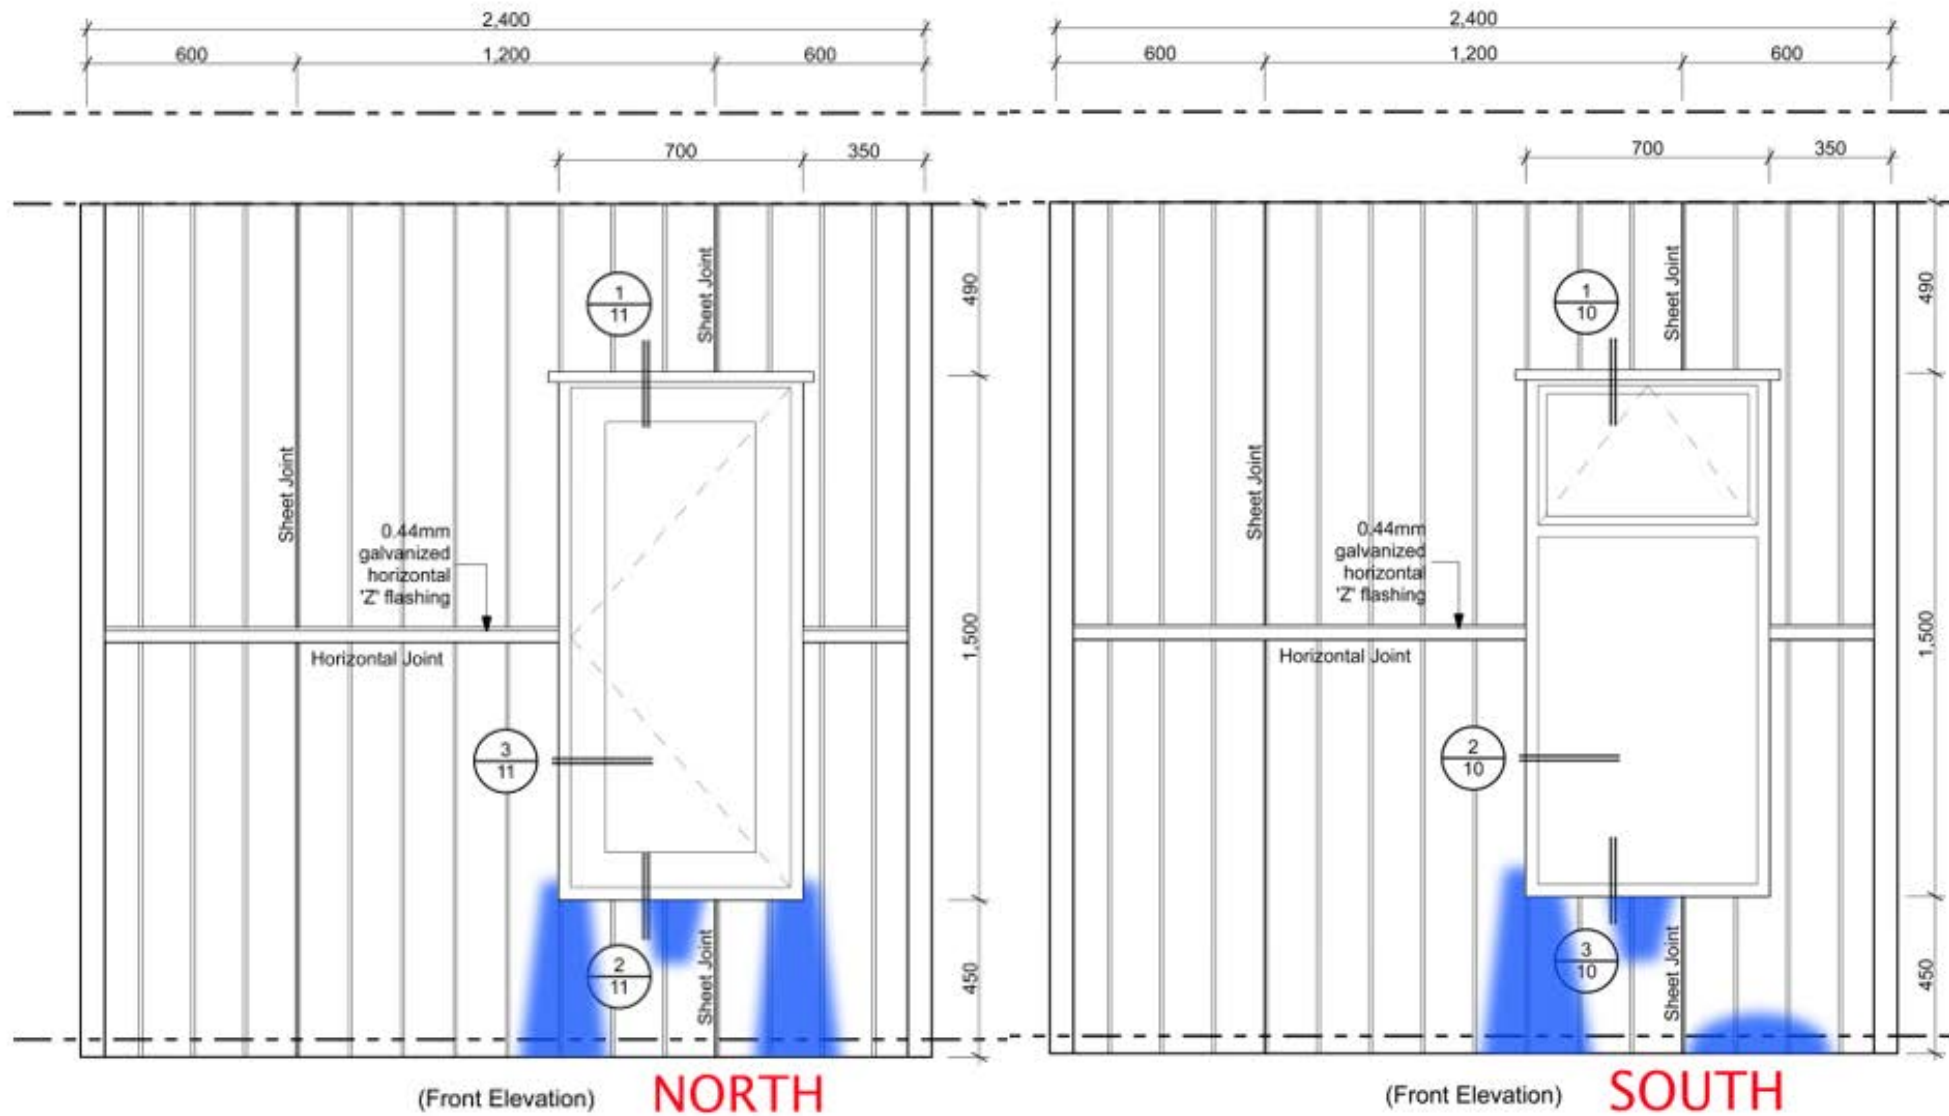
Test hut North and South walls, exterior view, leaking from façade testing
